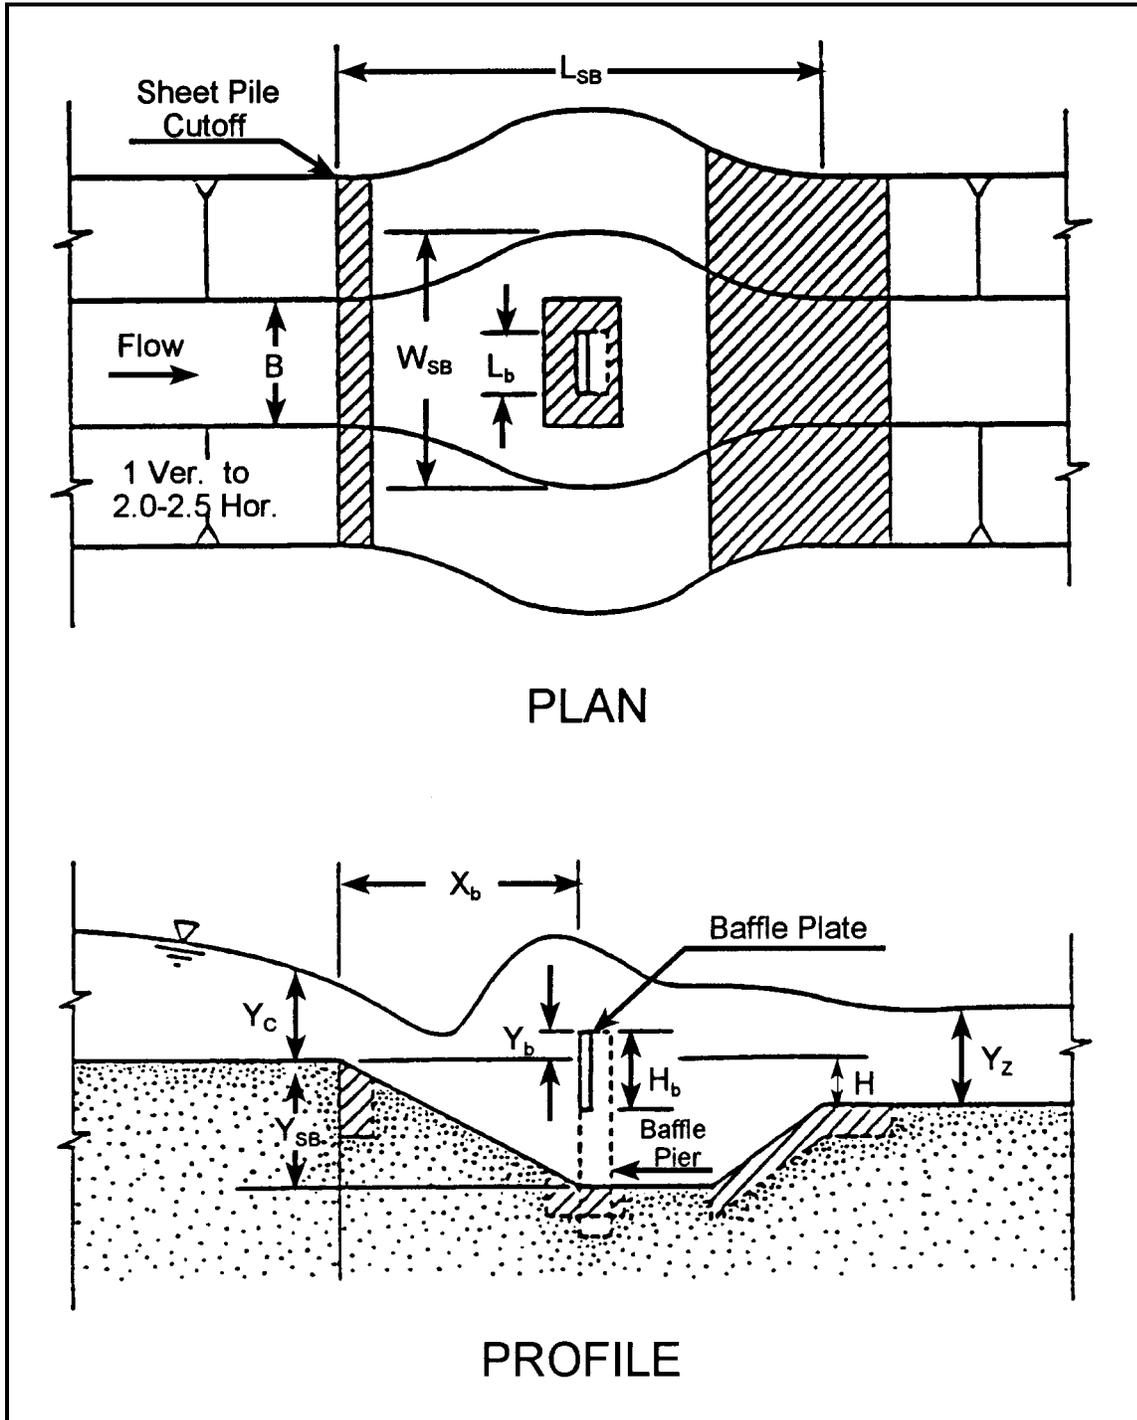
ARS-Type Grade Control Structure with Pre-formed Riprap Lined Stilling Basin and Baffle Plate (adapted from Little and Murphey, 1982)
